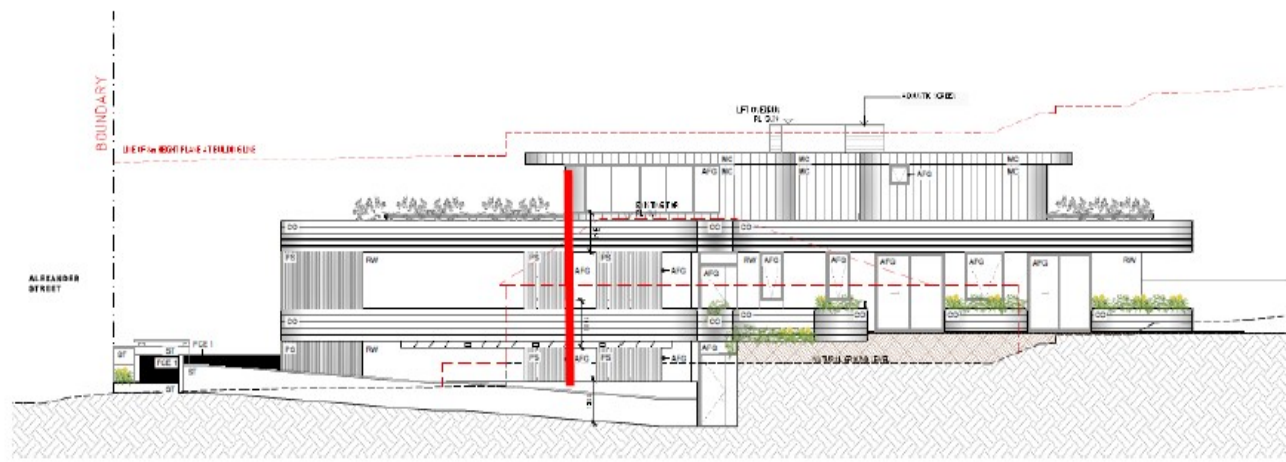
Plan extract showing the 3 storey building height as viewed from the west
